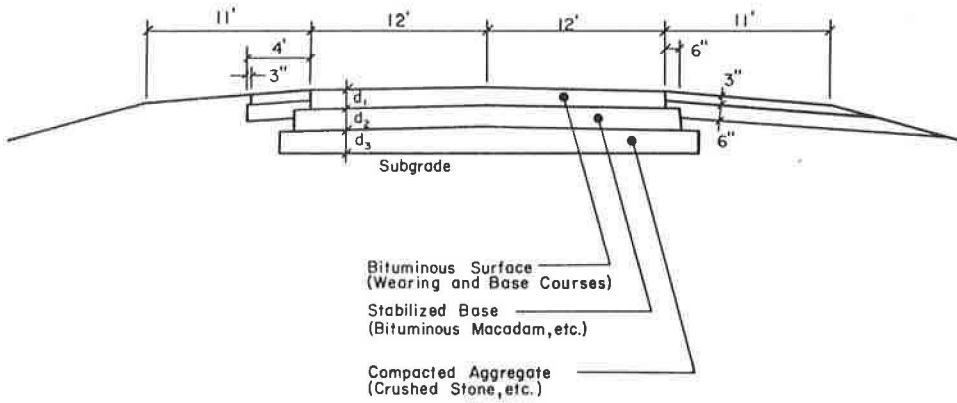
Typical cross section of a flexible pavement without subbase for a four-lane highway, one direction.
